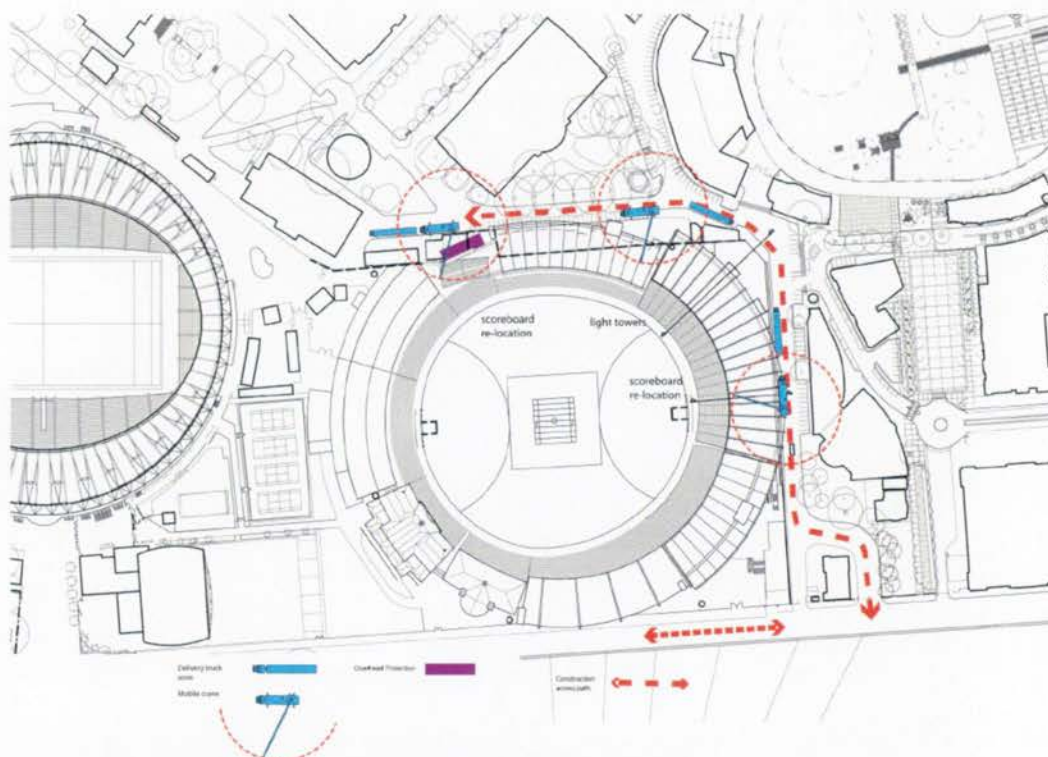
Early Works Demolition and Excavation (Source BBC Consulting Planners)
